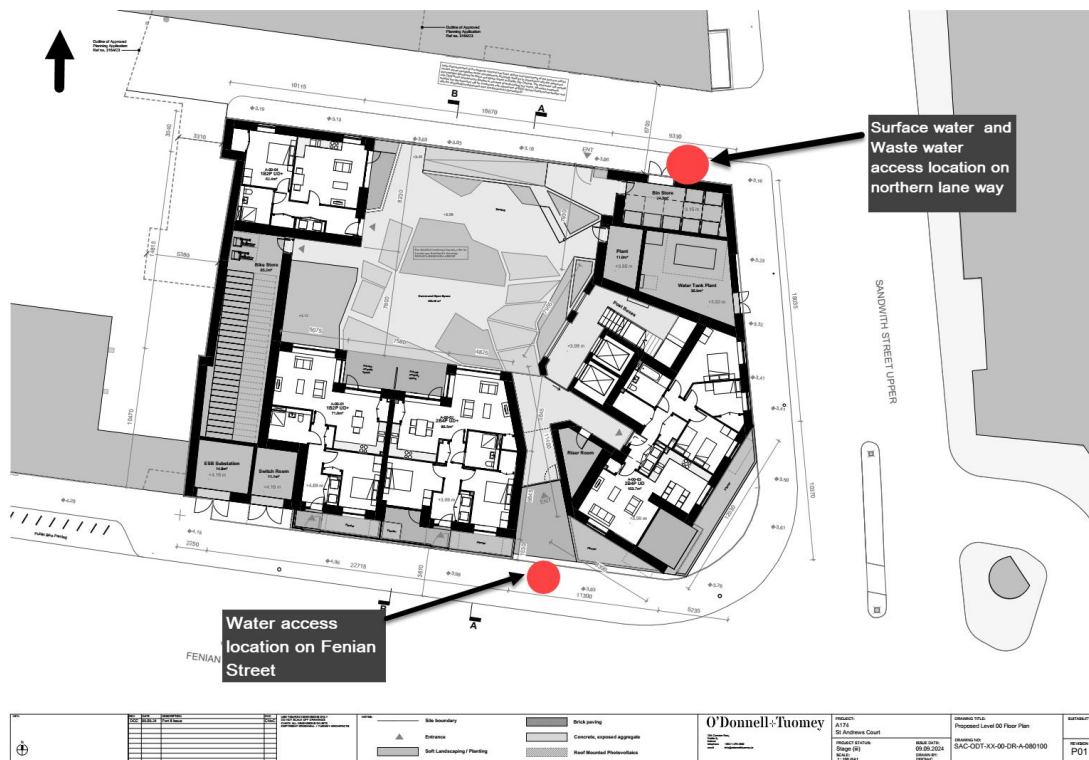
Proposed service access locations (Refer to Drainage Layout by Horgan Lynch)
